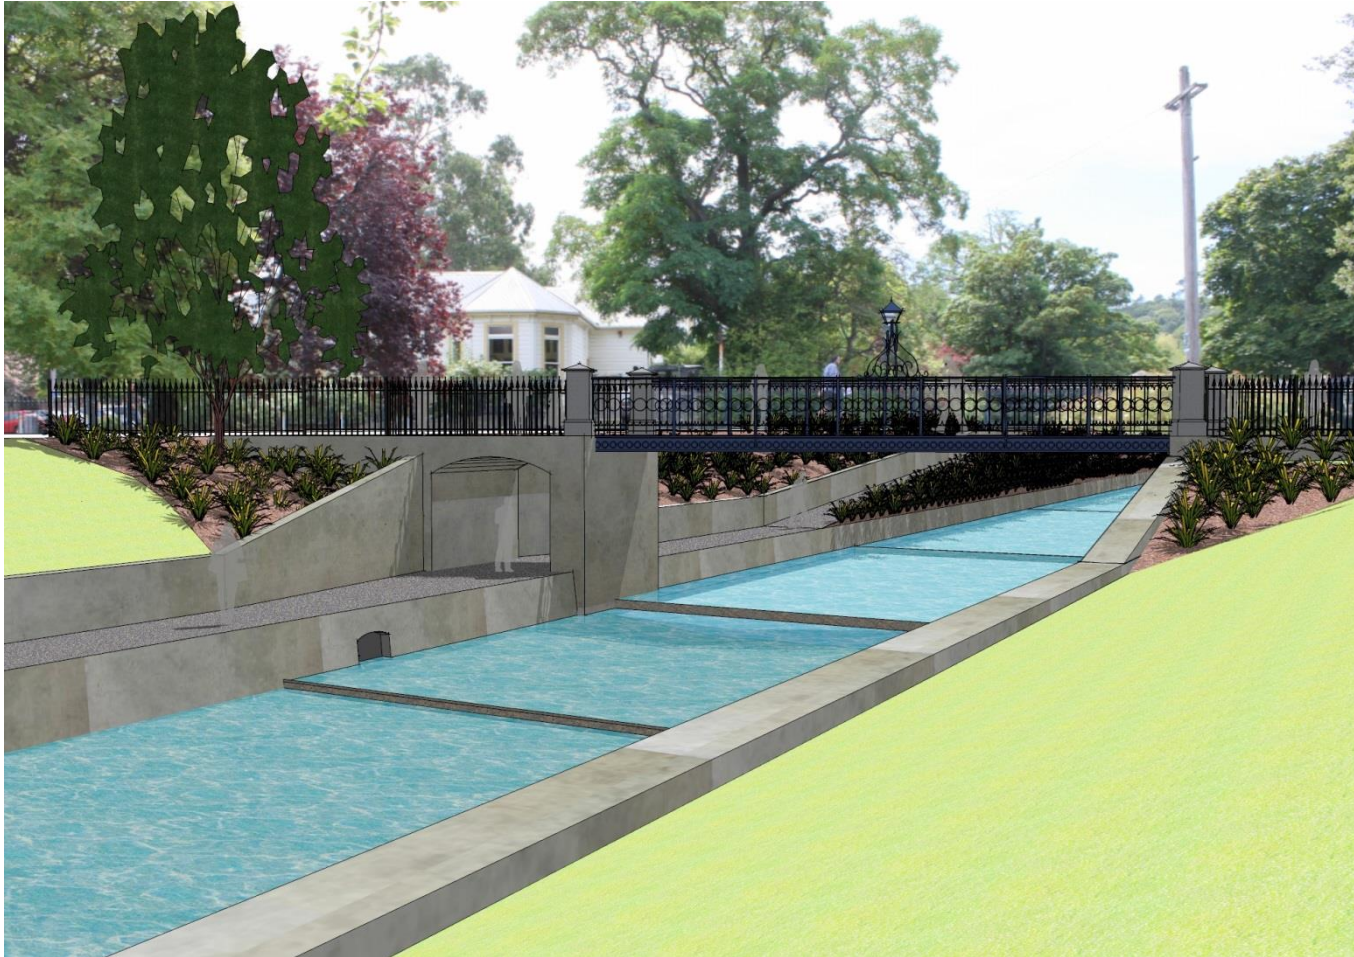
Artists' Impression of Proposed Modifications at the St David Street Footbridge and the pedestrian walkway extending to Montgomery Avenue.
